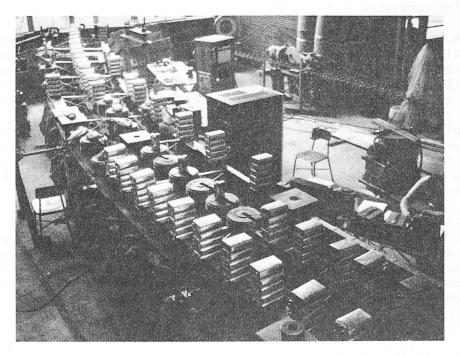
Dead Loading on Small Scale Seekonk River Bridge
